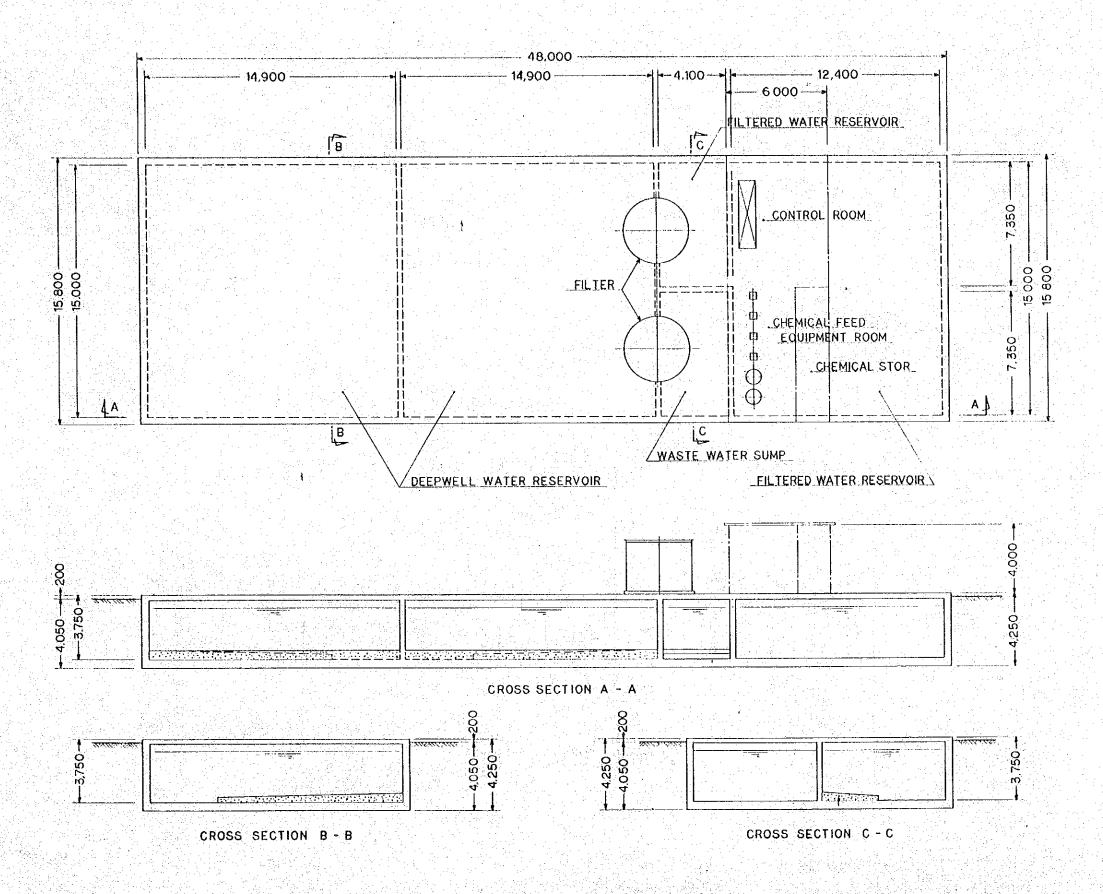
PLAN OF GROUND WATER TREATMENT FACILITY
